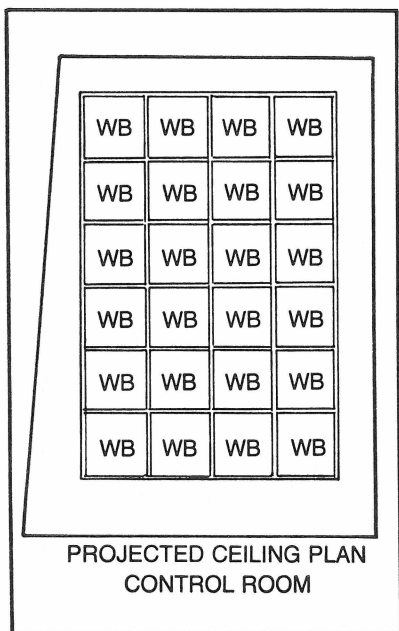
Projected ceiling treatment plan of control room showing positions of 24 wide band (WB) modules.
